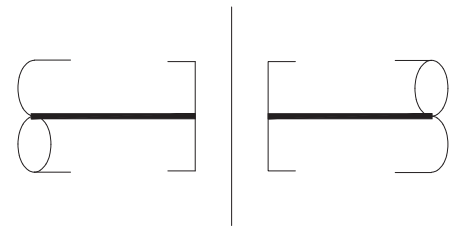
Threaded and socket-weld drawing symbols.
